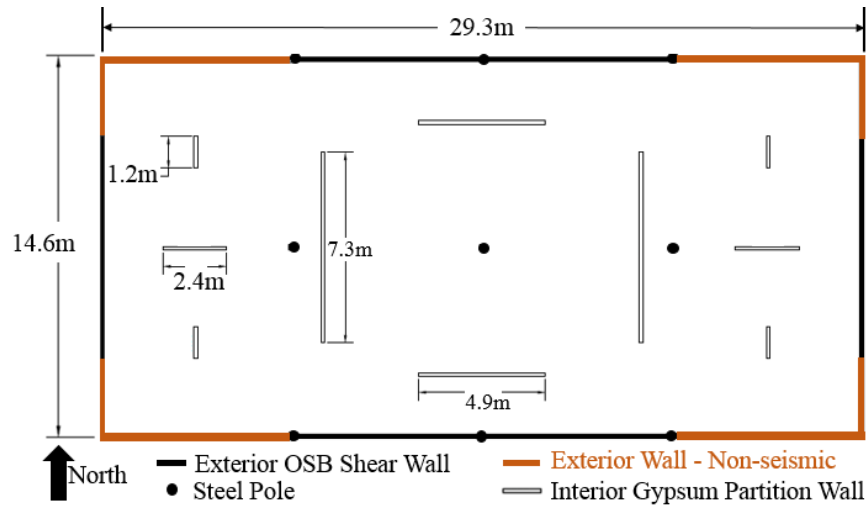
Plan view of the shear and bearing wall layout for the two and four-story commercial buildings. The one-story commercial archetype is the same, but without the interior gypsum partition walls (Original image provided by D. Jared DeBock and modified here).
